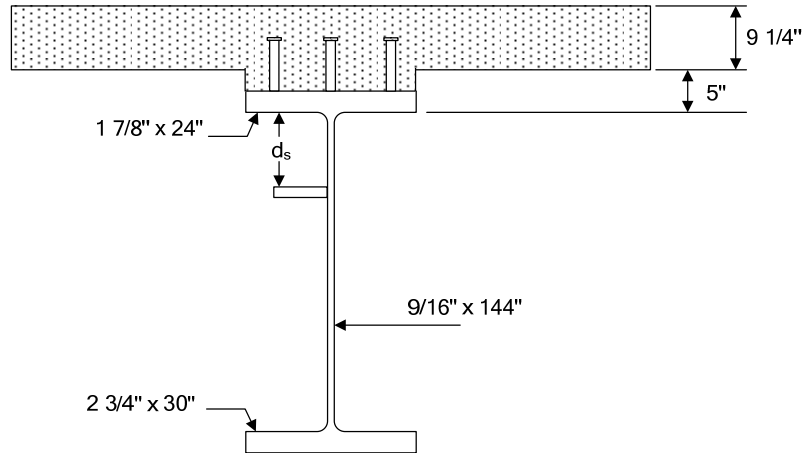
Longitudinally Stiffened Girder Section – Positive Flexure Region
